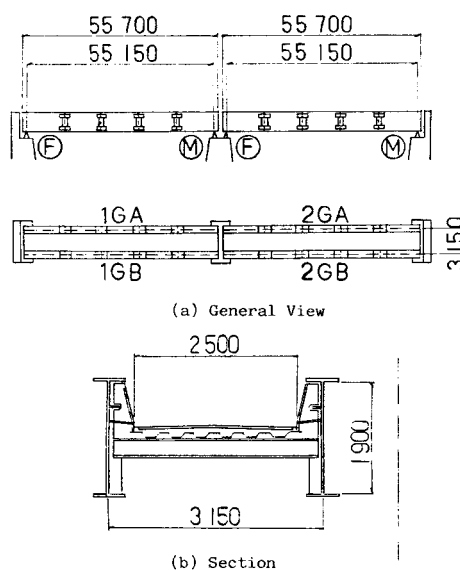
A Plate Girder Bridge of Half Through Type (TYPE-1).
